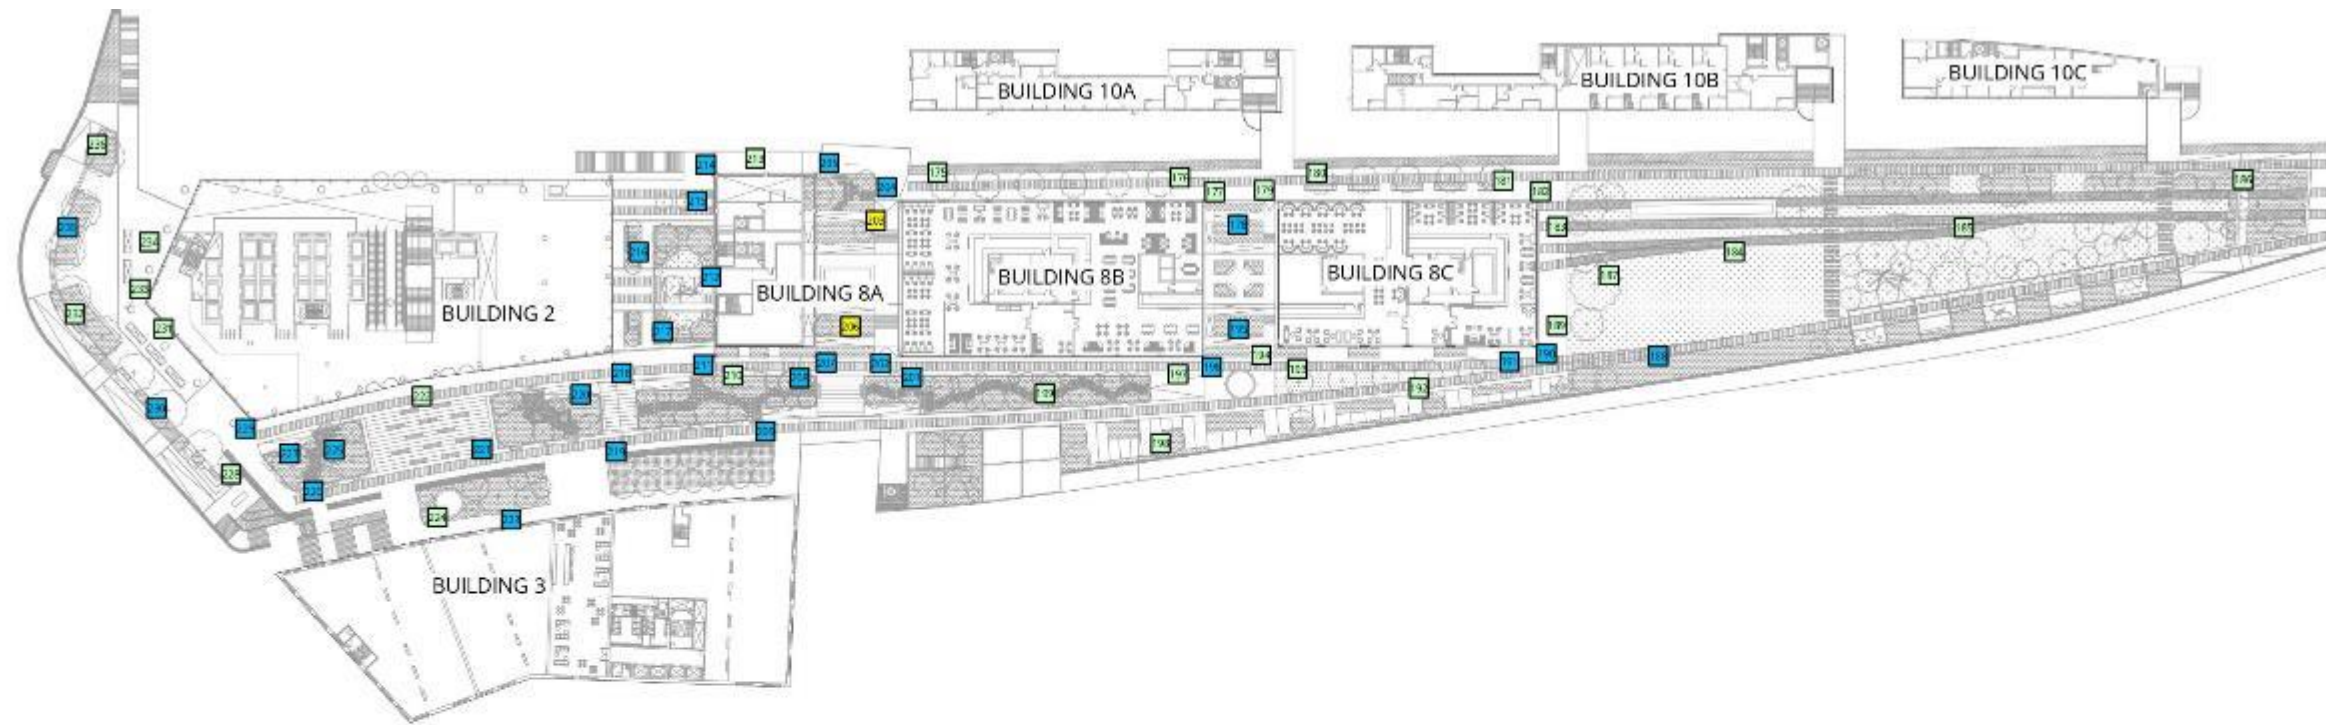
Revised Scheme with Landscaping, Wind Mitigation and Existing Surrounding Buildings – Summer Season, Ground Level
